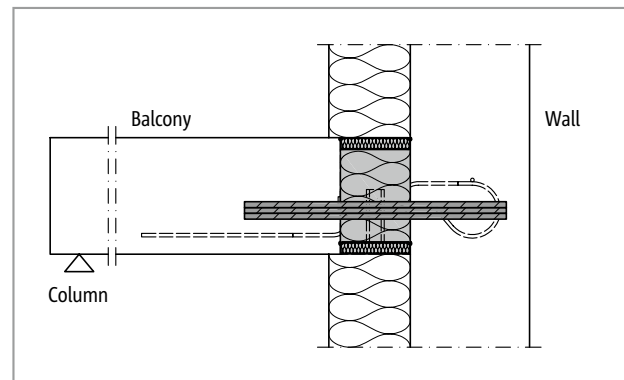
Schöck Isokorb® XT type Q, H-VV-NN: Connection to a reinforced concrete wall with external insulation
